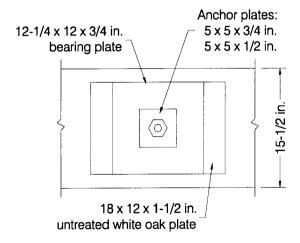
Details of the Dean bridge discrete plate bar anchorage configuration.
